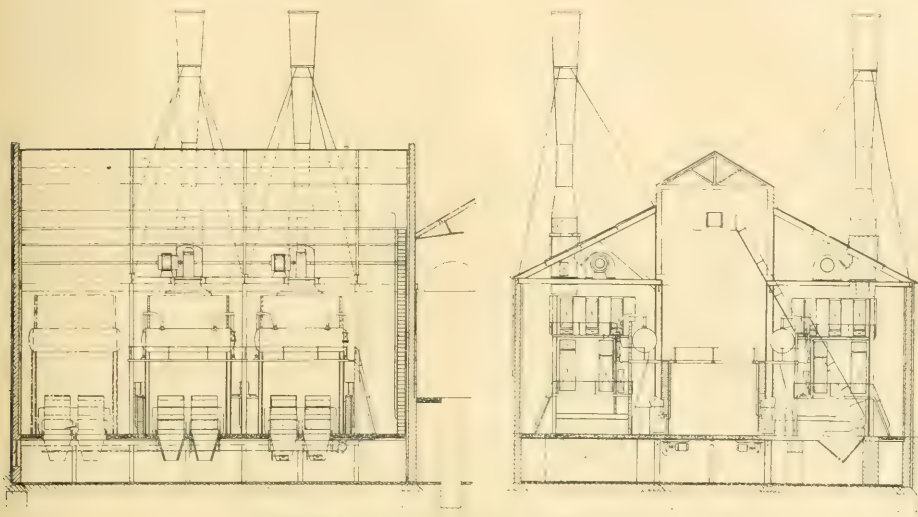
VIEWS SHOWING ARRANGEMENT OF SELF-CONTAINED BOILER UNITS.
